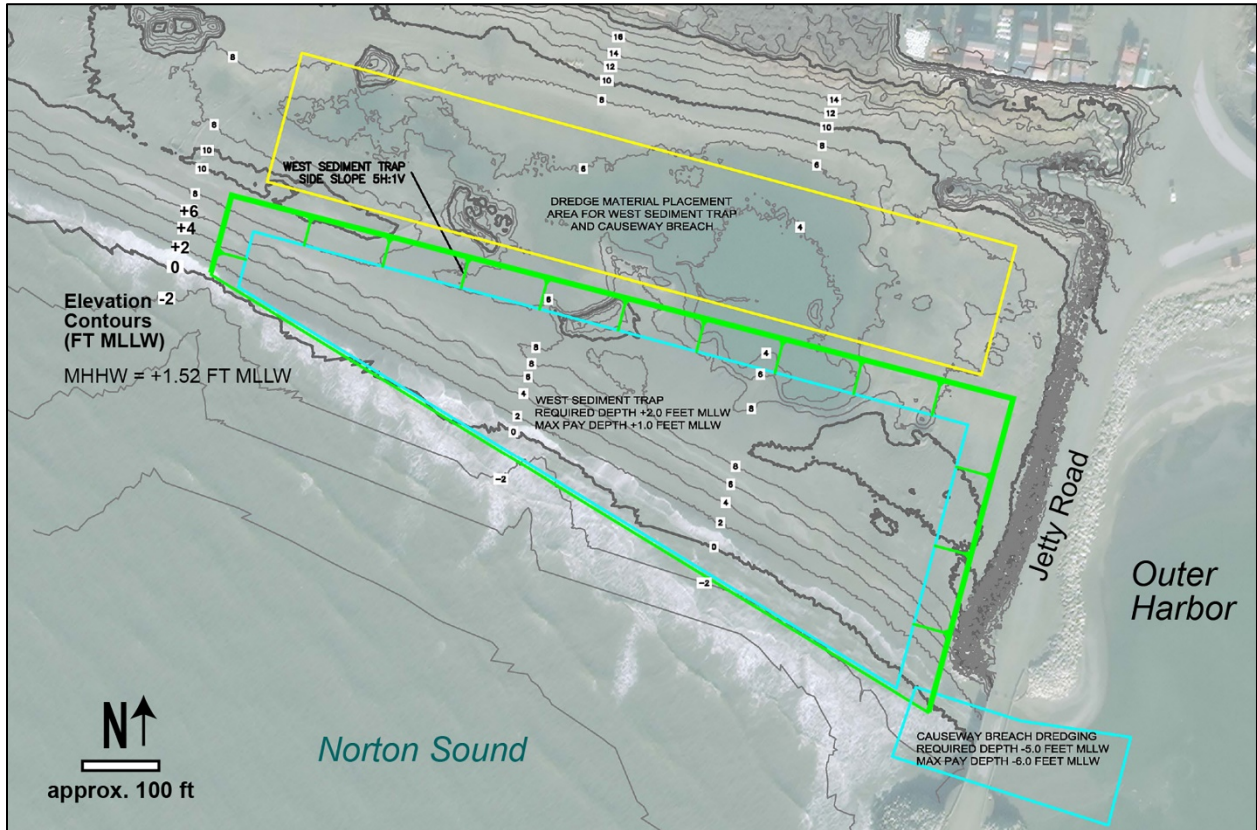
Proposed west sediment trap and adjacent excavated material placement area.
